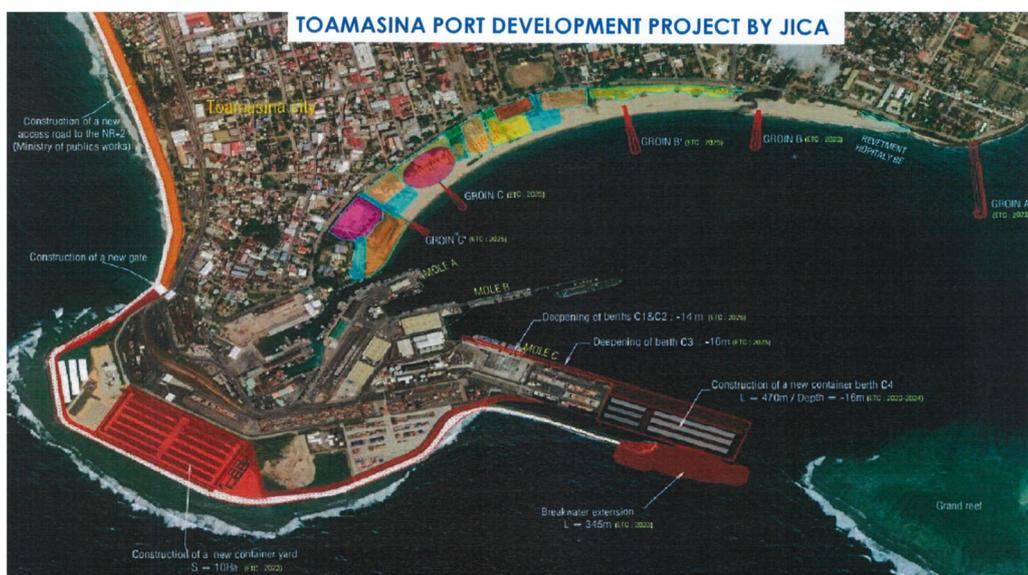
Toamasina Port expansion and development plan (project on-going)
